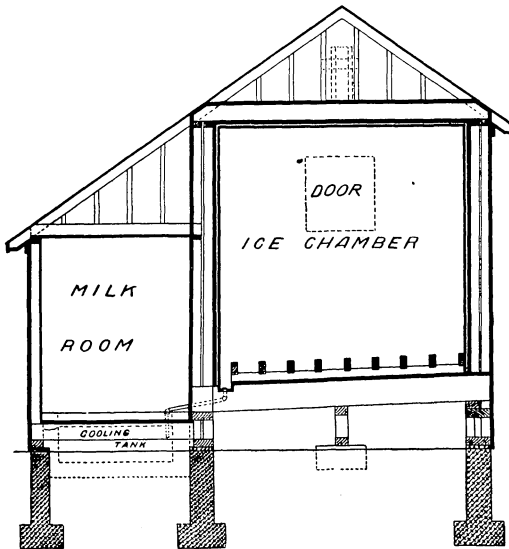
Cross section of ice house and milk room shown in fig. 31.
